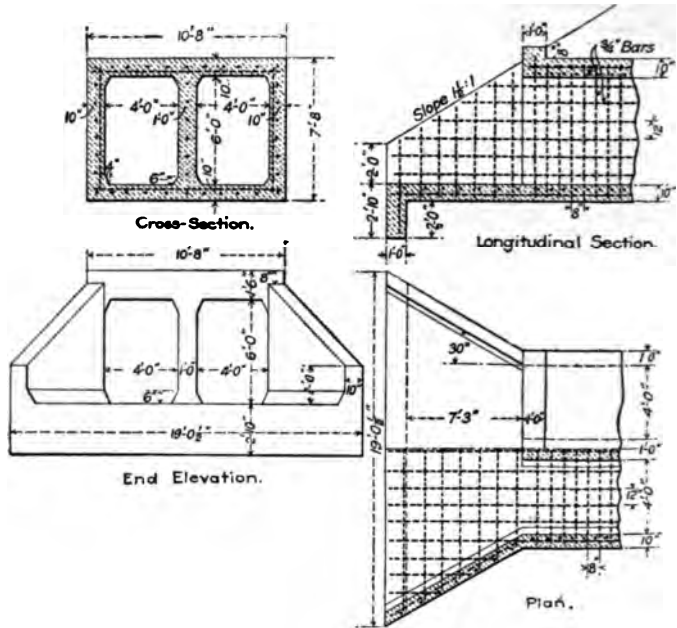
Double Box Culvert, K. C., M. & O. Ry.
